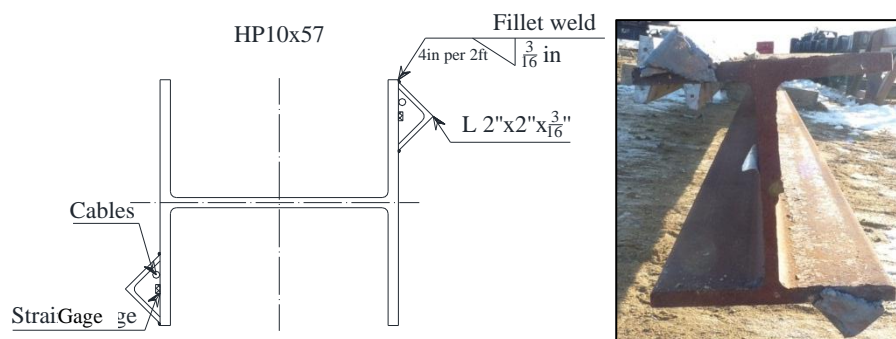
Cross-Section View of HP 10 x 57 Pile Showing the Strain Gage Location
